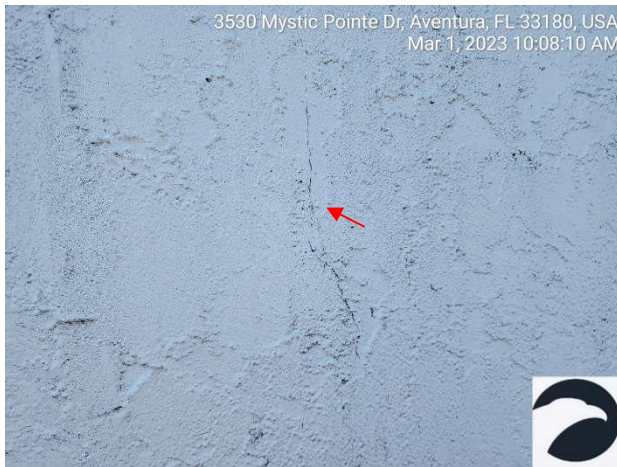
c.29 – Cracked stucco at parapet wall (Roof Level)
